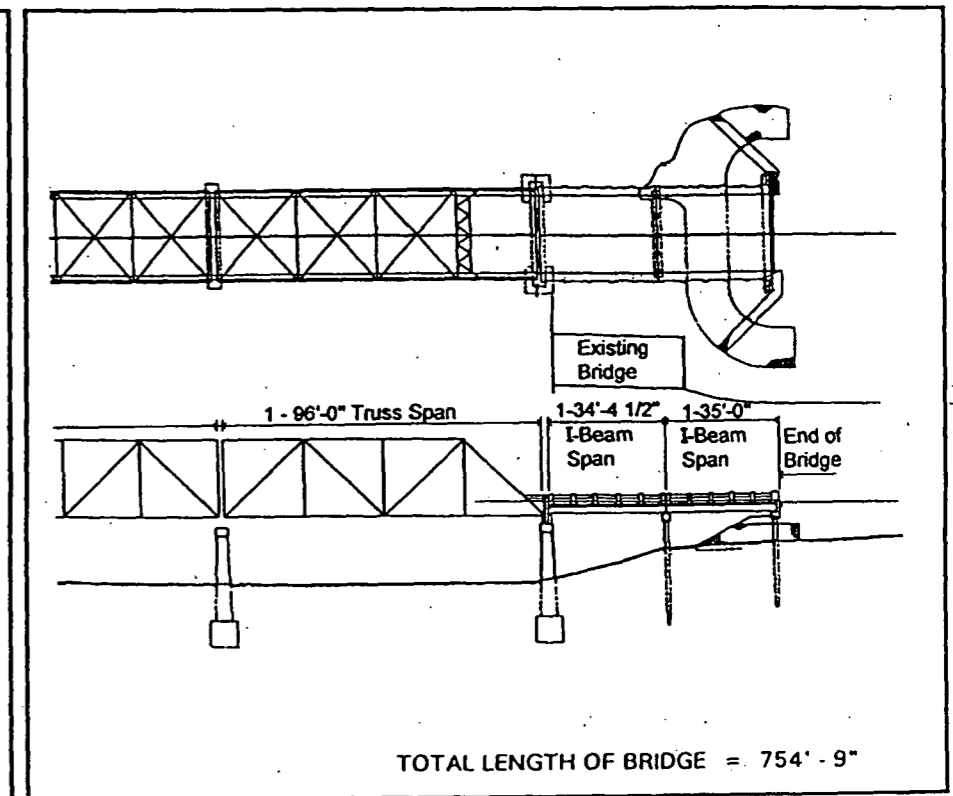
Elevation of the Brazos River bridge as shown in the 1939 plans.
